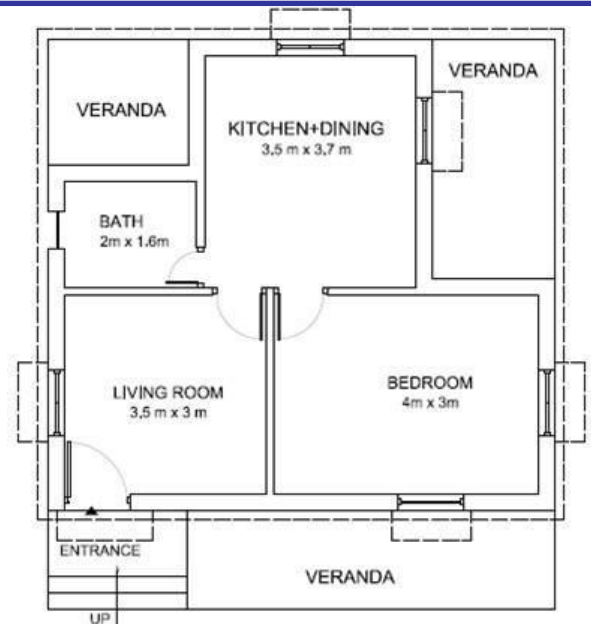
Plan of a single dwelling unit of 37m<sup>2</sup> area for a family of four [Auto-cad drafting]
